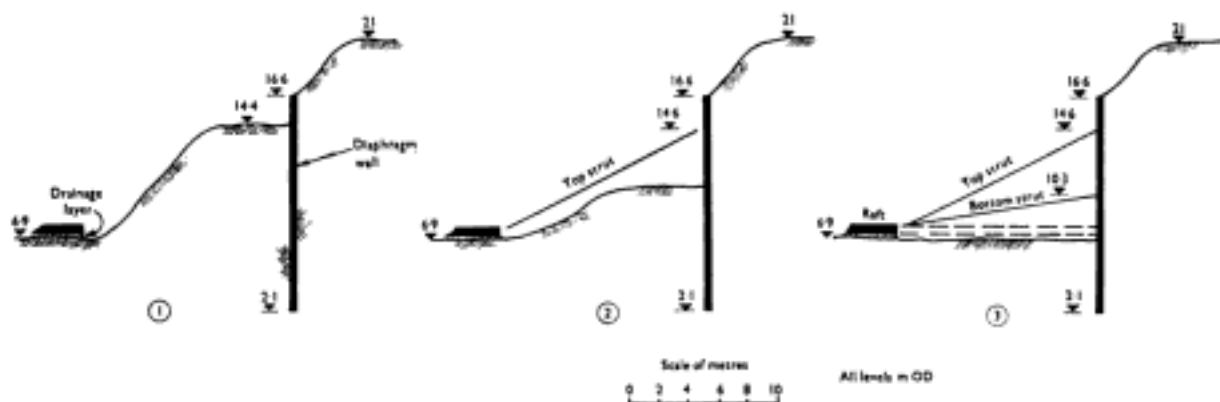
Basement construction: excavation sequence for north diaphragm wall by Rendex steel struts from completed centre area of raft, Kensington Town Hall, London (Corbett et al.⁸)
